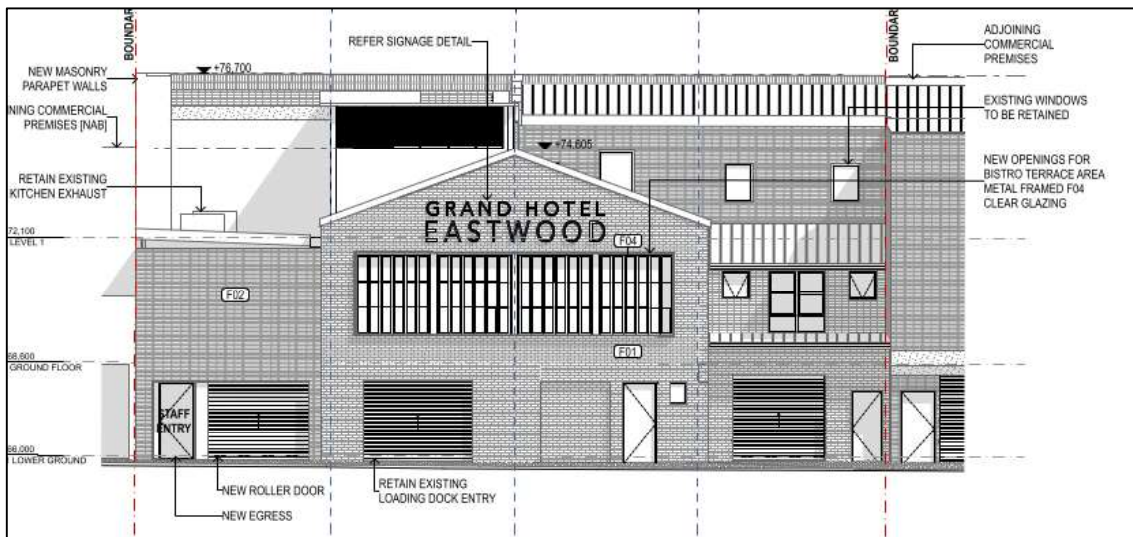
Proposed Northern Elevation (Hillview Lane) and Signage
